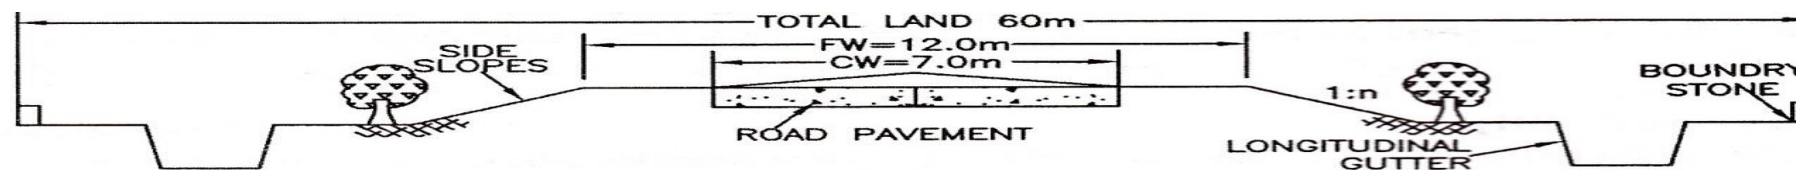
CROSS-SECTION OF NH OR SH IN RURAL AREA IN EMBANKMENT
